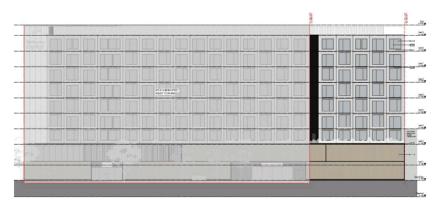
Proposed Northern Elevation (showing 2-8 Sarah Street hatched in grey)
